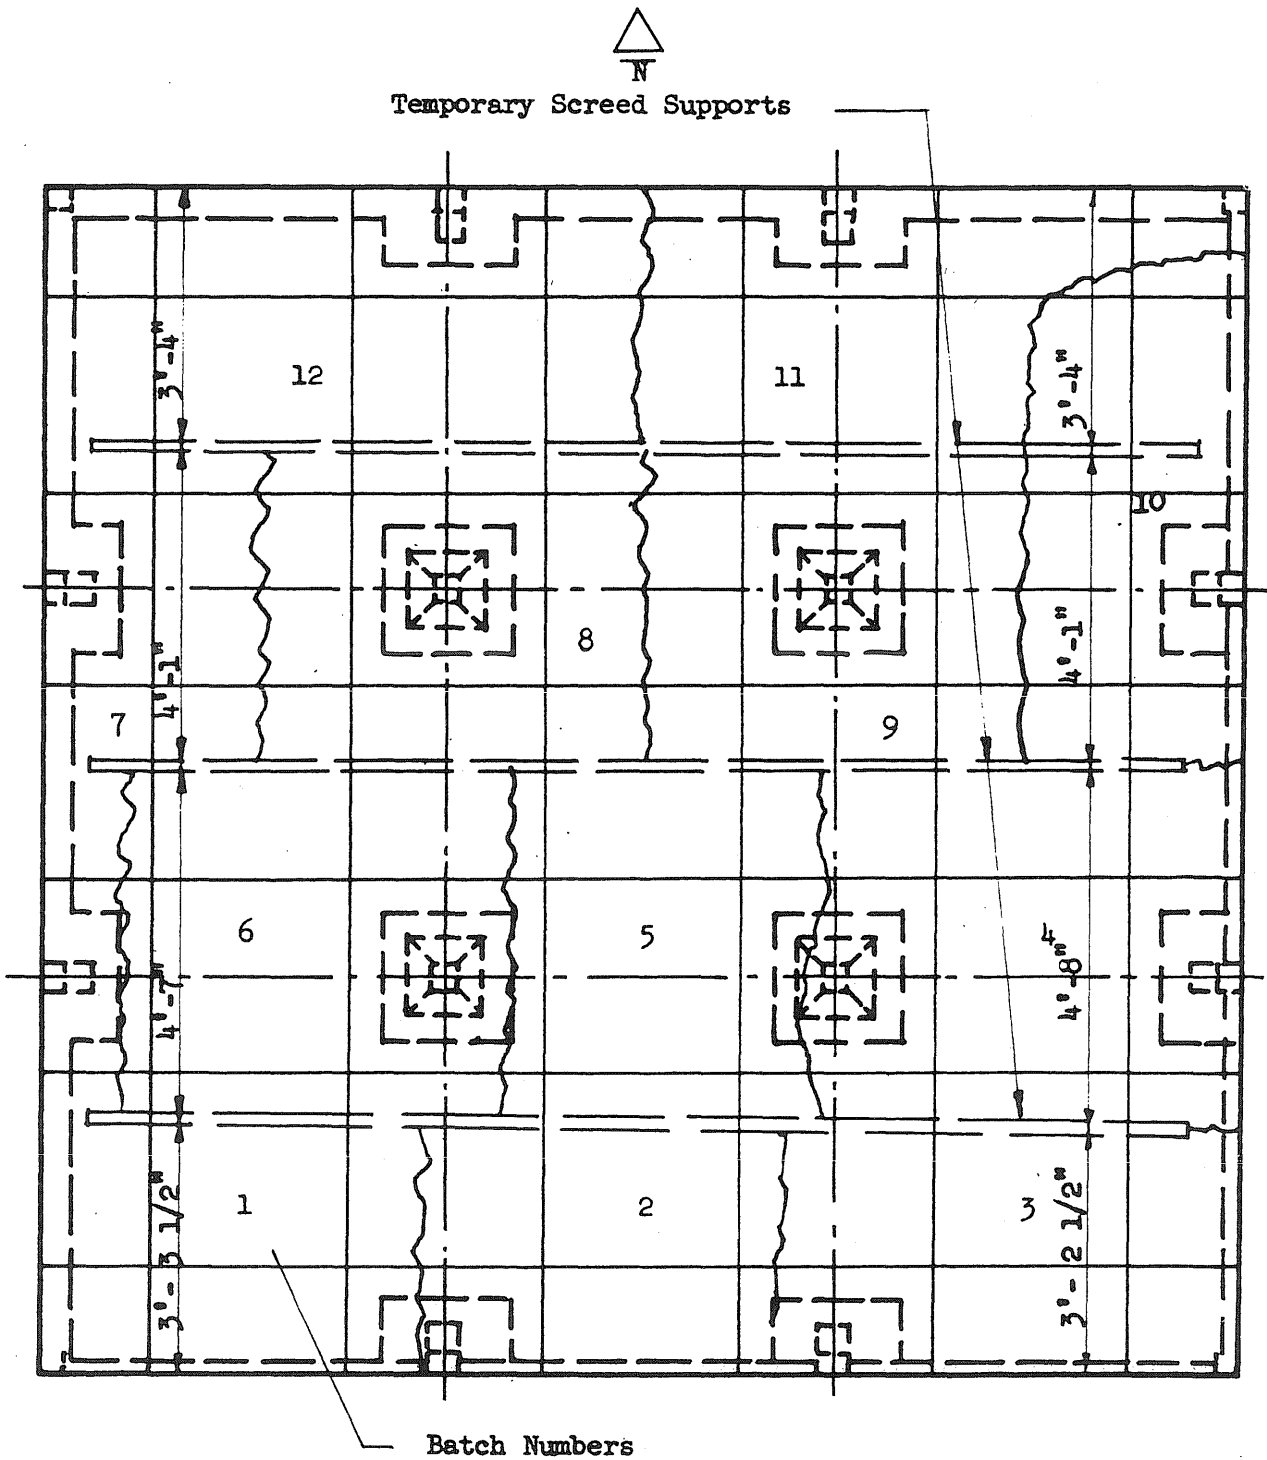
LOCATION OF CONCRETE BATCHES
